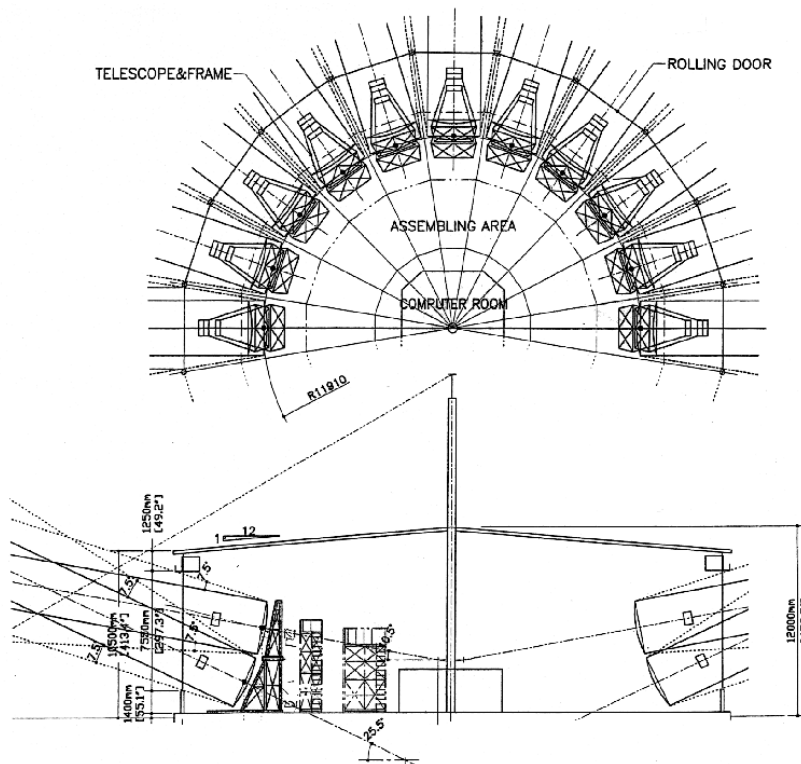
Plan and cross sectional view of the telescope housing.
